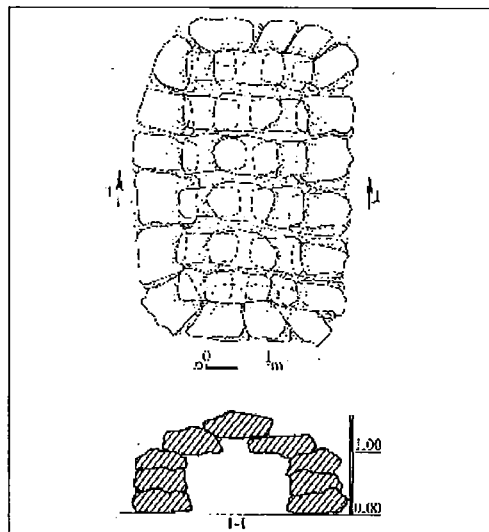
Elliptical, 'turtle-shell' shaped Dolmen; plan and Section
